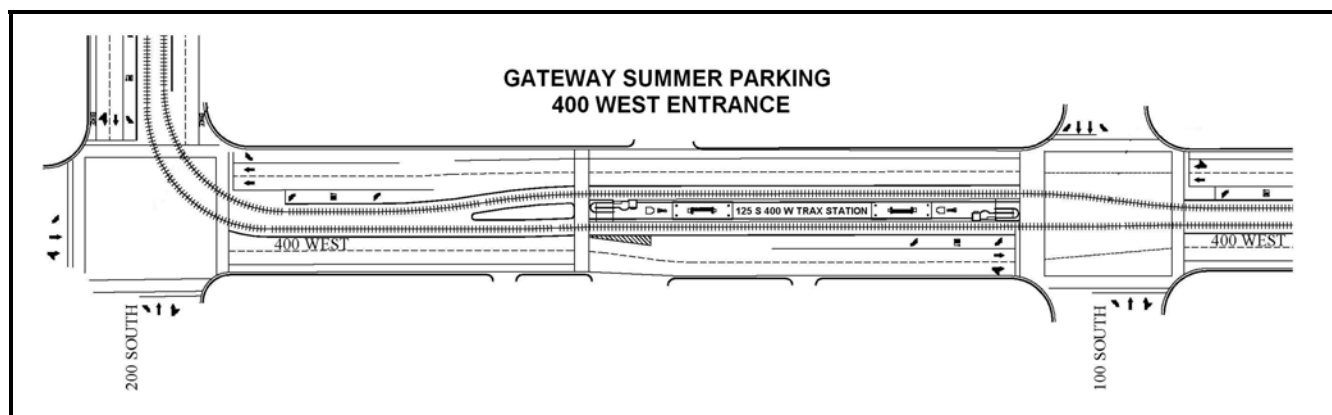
125 South 400 West Station (construct with TRAX Connection)
